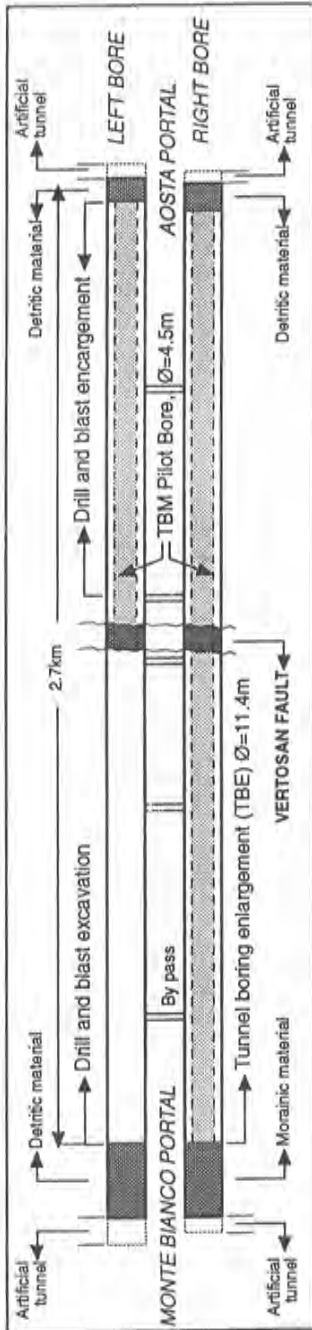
Plan view of 2 bores of Avisa Tunnel showing the excavation scheme.
